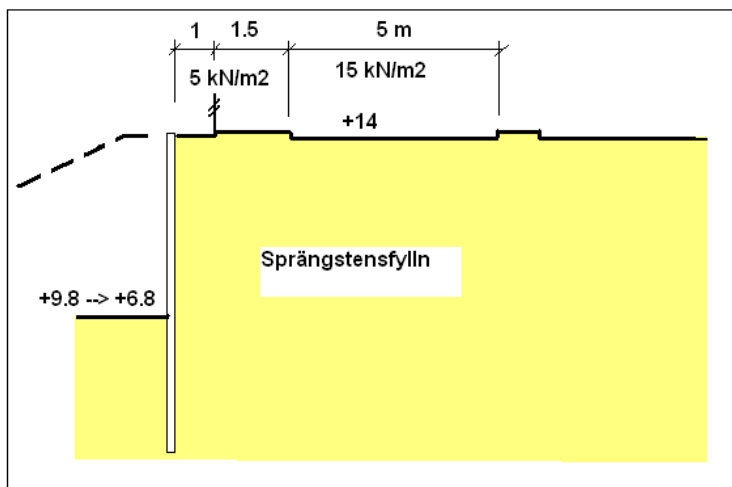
Excavation at a drilled micro pile wall at Kungsholmen, Stockholm, 2007
